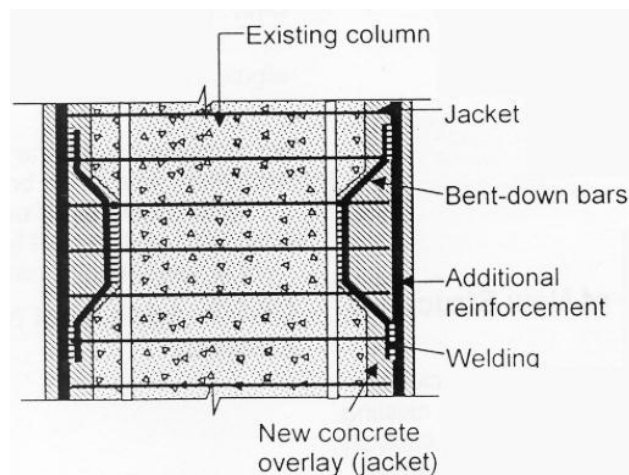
Lap welded to bars of Jacket and Longitudinal bars
